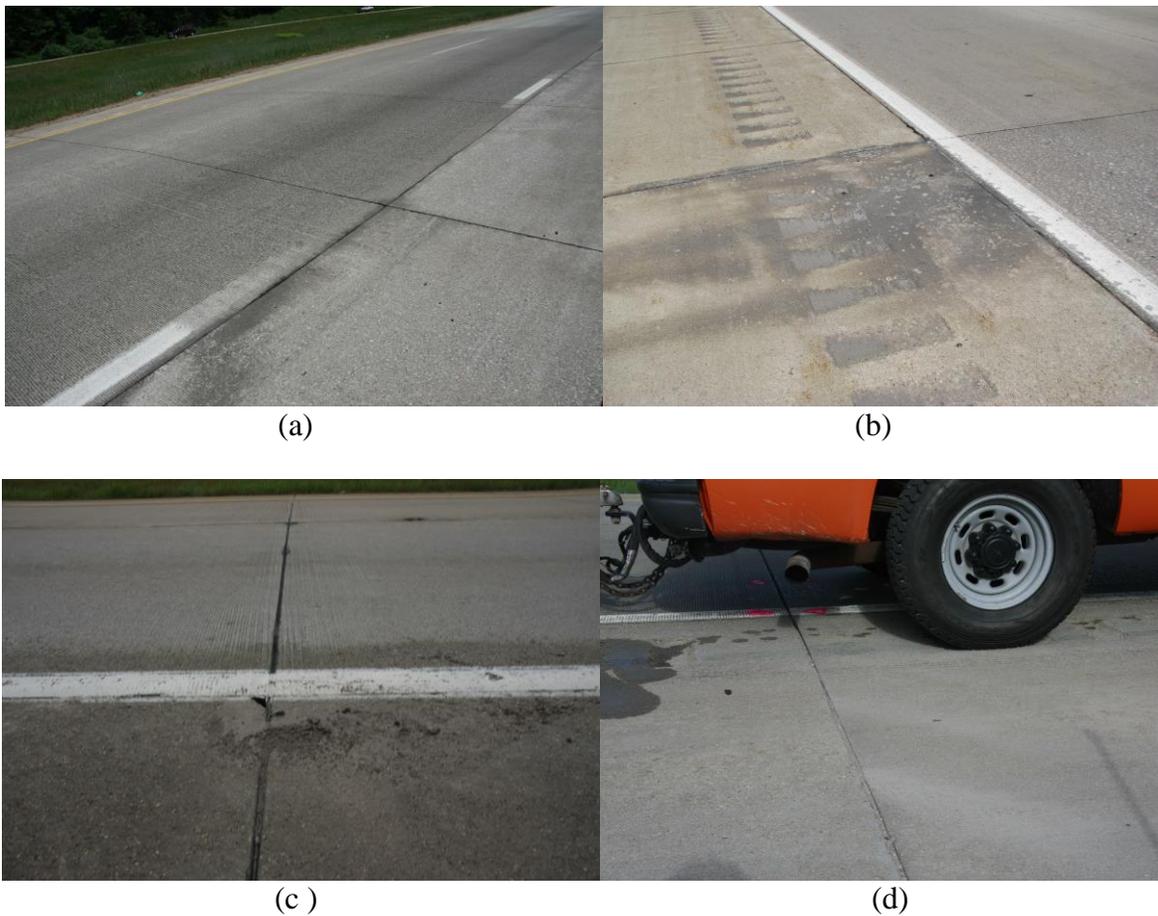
(a-d). Typical pumping observations following a heavy rain-fall.
